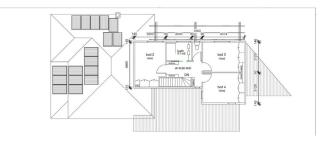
Proposed Level 1 plan of case study building showing existing building to the left and proposed additions to the right. Source: Byrne Building Design, 2023
